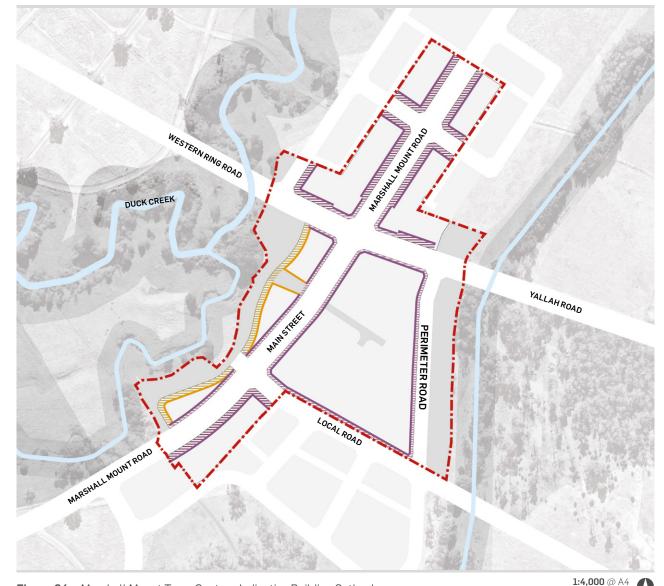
Marshall Mount Town Centre - Indicative Building Setbacks
